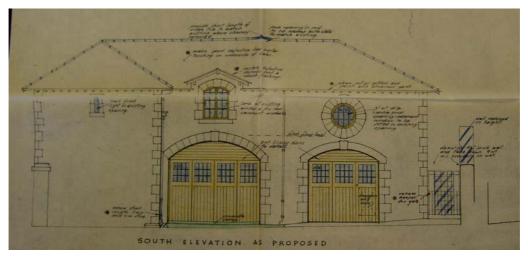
Coach House south elevation as proposed in 1966 (BDB 33/12/9 1966-9)
